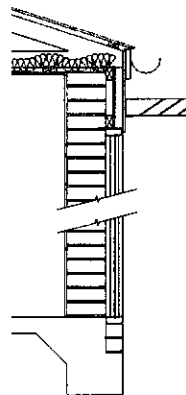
Section through an un-vented Trombe-Michel wall
